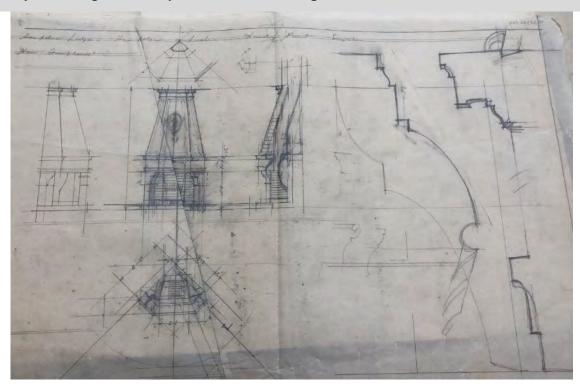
New corner fireplace (Source: State Library of NSW, PXD 351 Roll No. 274, f 2661)
